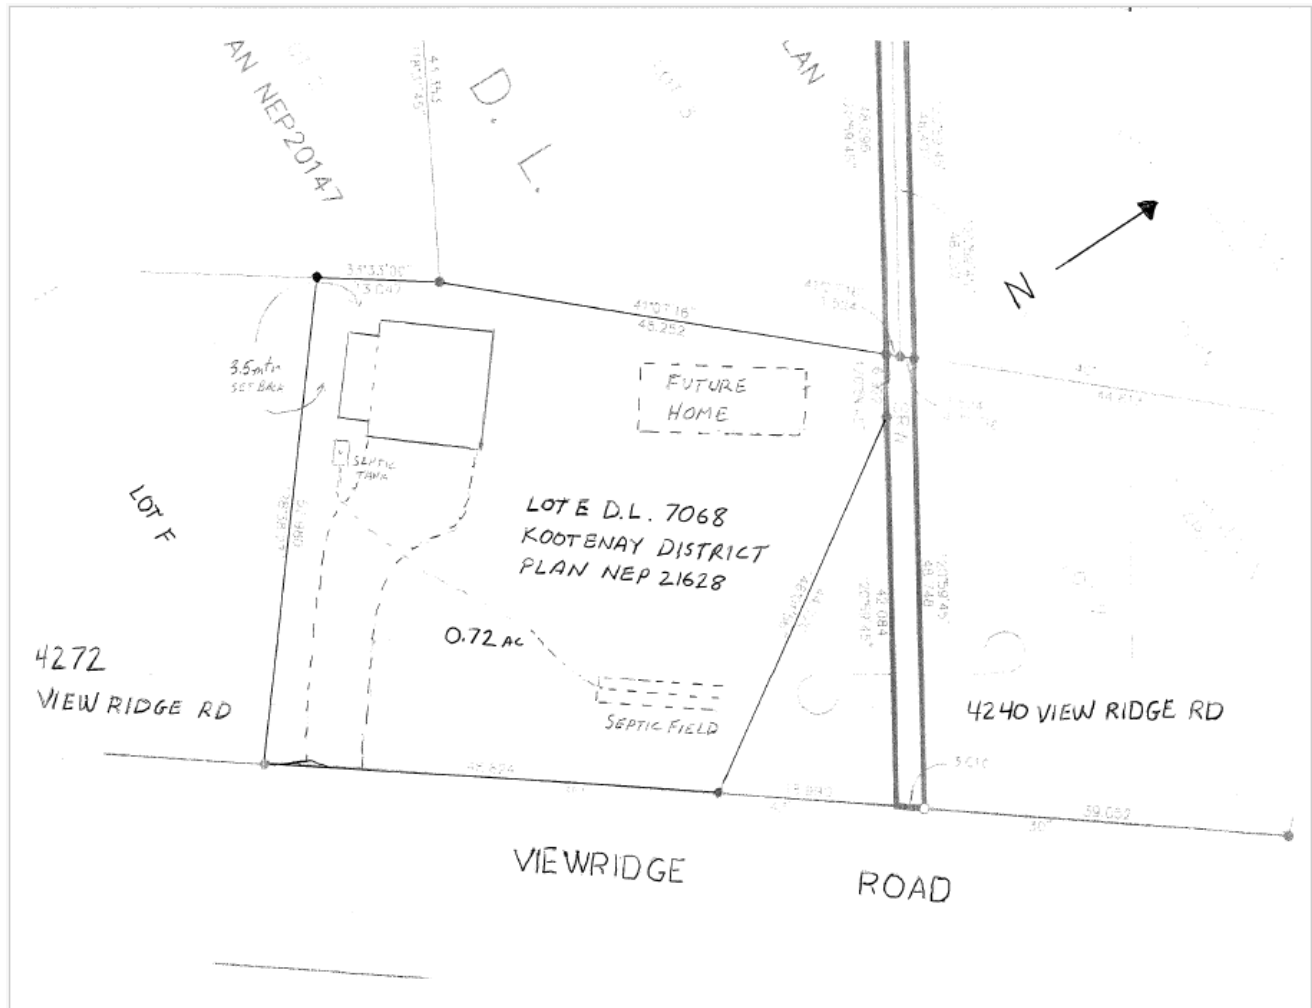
Site Plan showing location of the proposed accessory building (solid outline) and future home (dashed outline)
